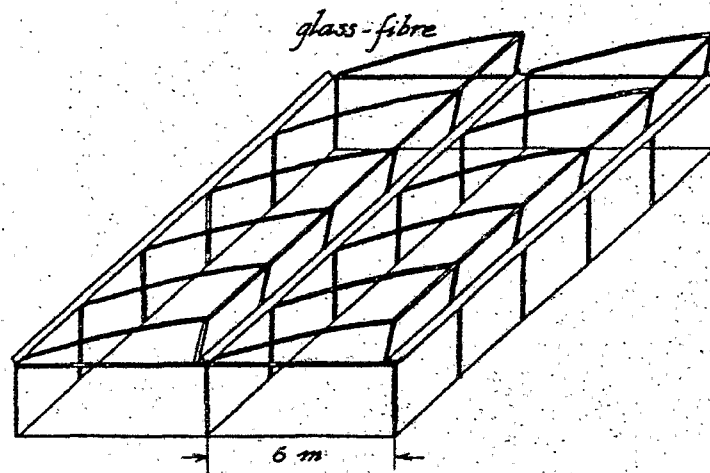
A shed roof type greenhouse in Israel (FAO book)
